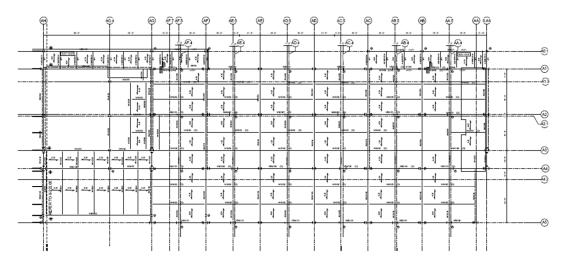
THIS IS THE TYPICAL FRAMING PLAN OF ONE FLOOR OF THE NEW YORK POLICE ACADEMY. PLEASE NOTE THAT THE BUILDING IS SO OBLONG THAT EACH FLOOR PLAN IS SPLIT INTO TWO SHEETS WITH PART 1 (THE WEST END) AND PART 2 (THE EAST END).
